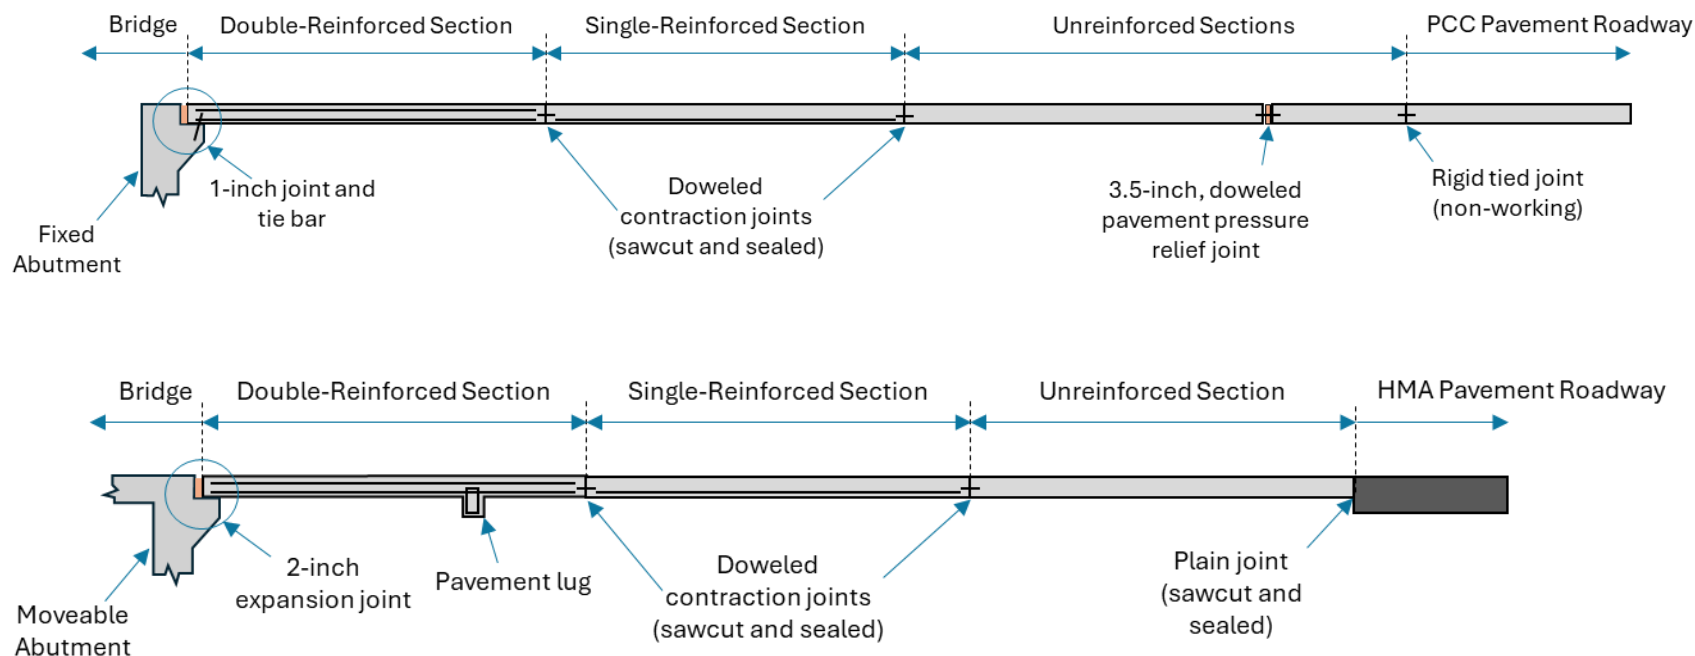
Schematic showing the reinforced and unreinforced concrete slabs and types of joints used in bridge approach systems for bridges carrying interstates or primary roads, excluding continuous concrete slab bridges. The top schematic represents the configuration used with a Portland cement concrete (PCC) pavement roadway and the bottom schematic represents the configuration used with a hot mix asphalt (HMA) pavement roadway.
